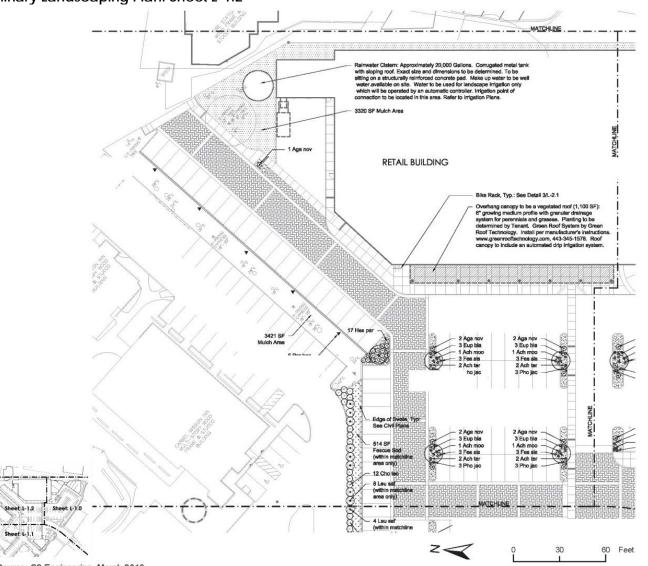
Preliminary Landscaping Plan: Sheet L-1.2
